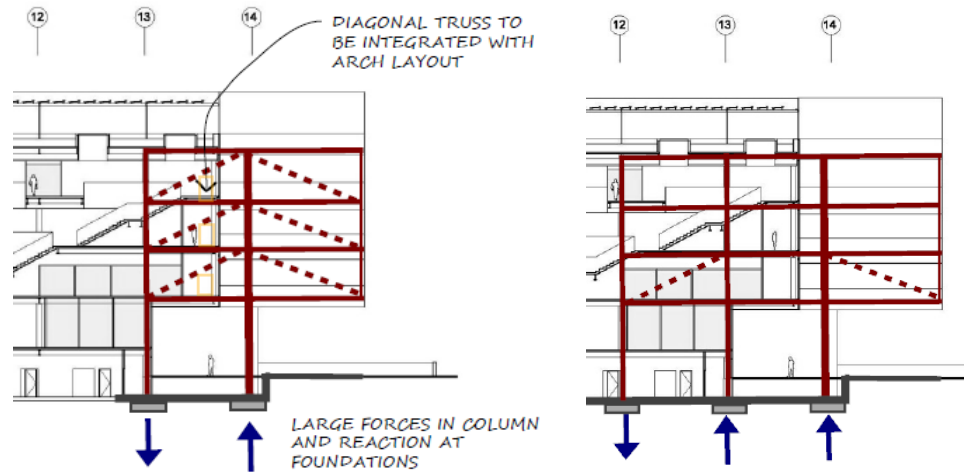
North Cantilever Overhang at SD (on left) and at DD (on right)
